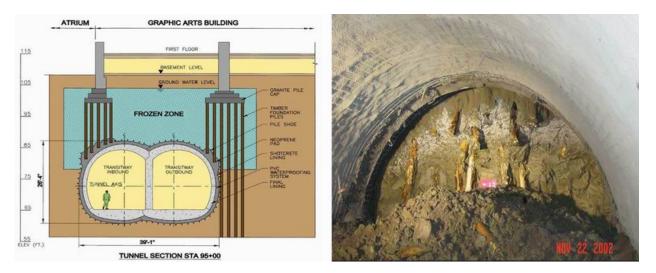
Typical cross section beneath building at Russia Wharf MBTA - Boston, MA 2002 Figure 21b: Exposed frozen ground and timber pile caps in tunnel crown MBTA - Boston, MA 2002
